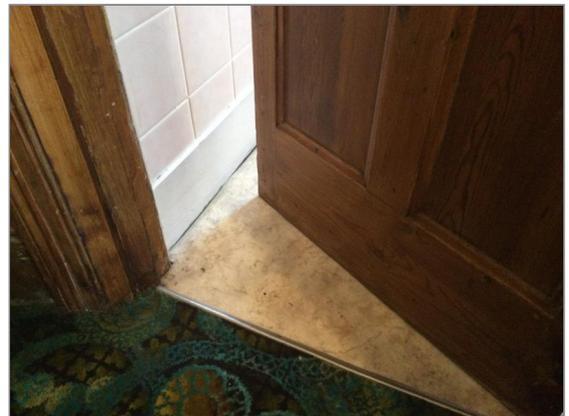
The first floor bathroom door was noted to scuff the floor when operated
